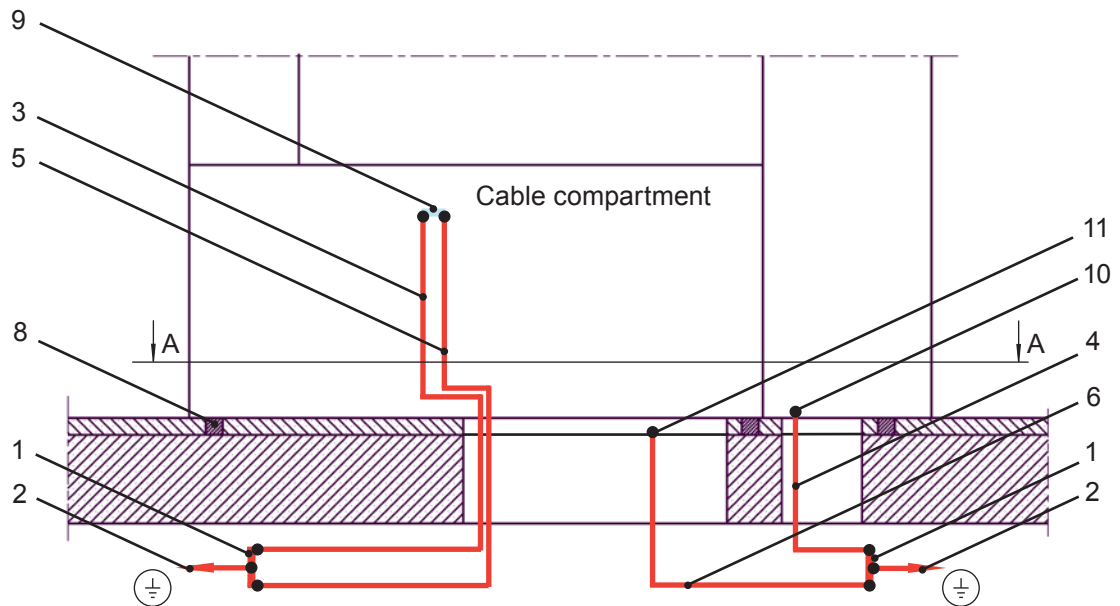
Earthing recommendation, shown schematically as a sectional elevation of the lower part of a panel including the concrete floor
